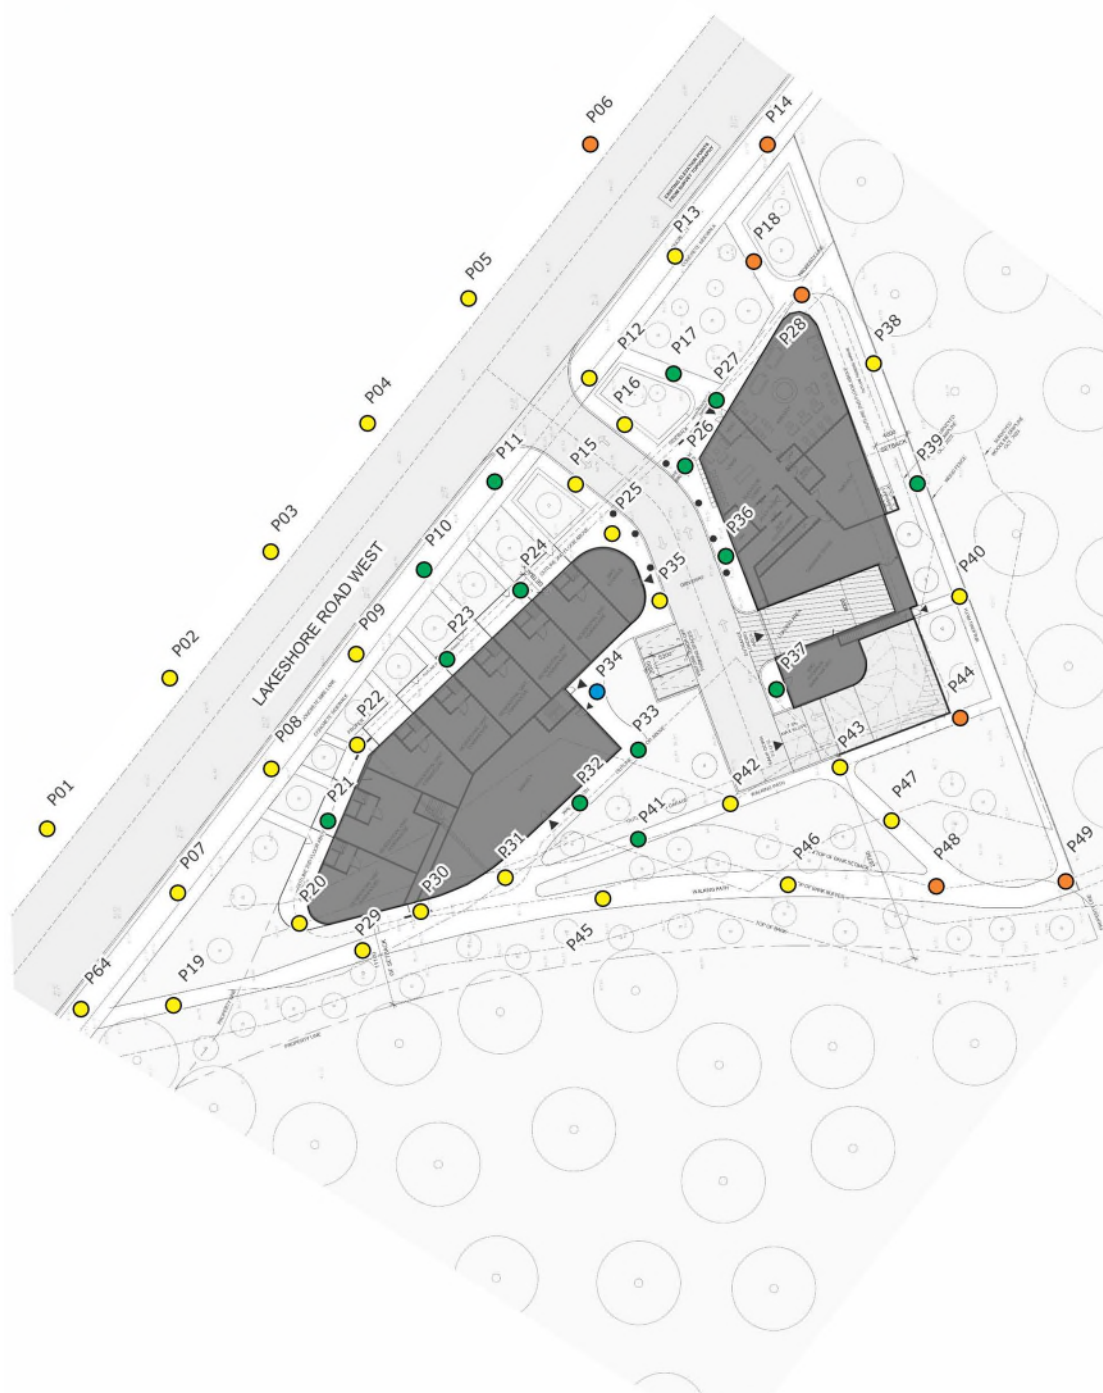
1f: Wind Tunnel Results – Proposed Scenario – Summer – Ground Level Plan
